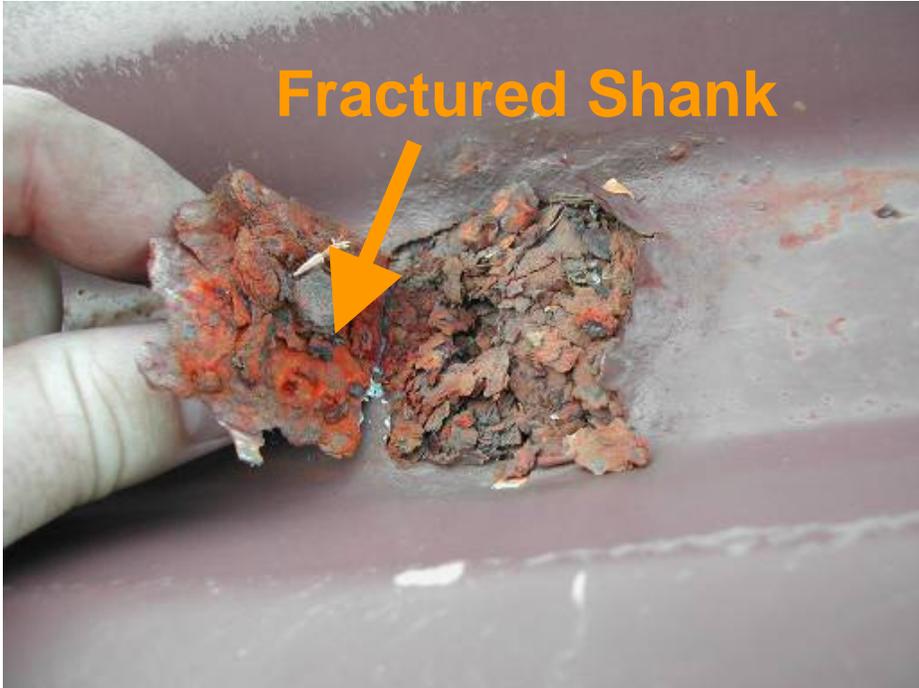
Failure of the metal deck fastener due to corrosion
